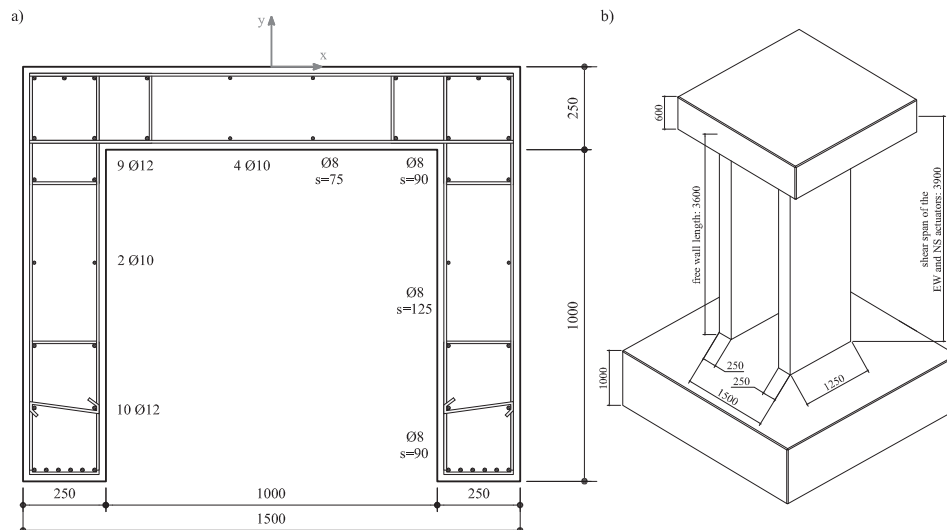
U-shaped walls tested in Ispra: Cross section (a) and elevation (b); all dimensions are in millimetres.
